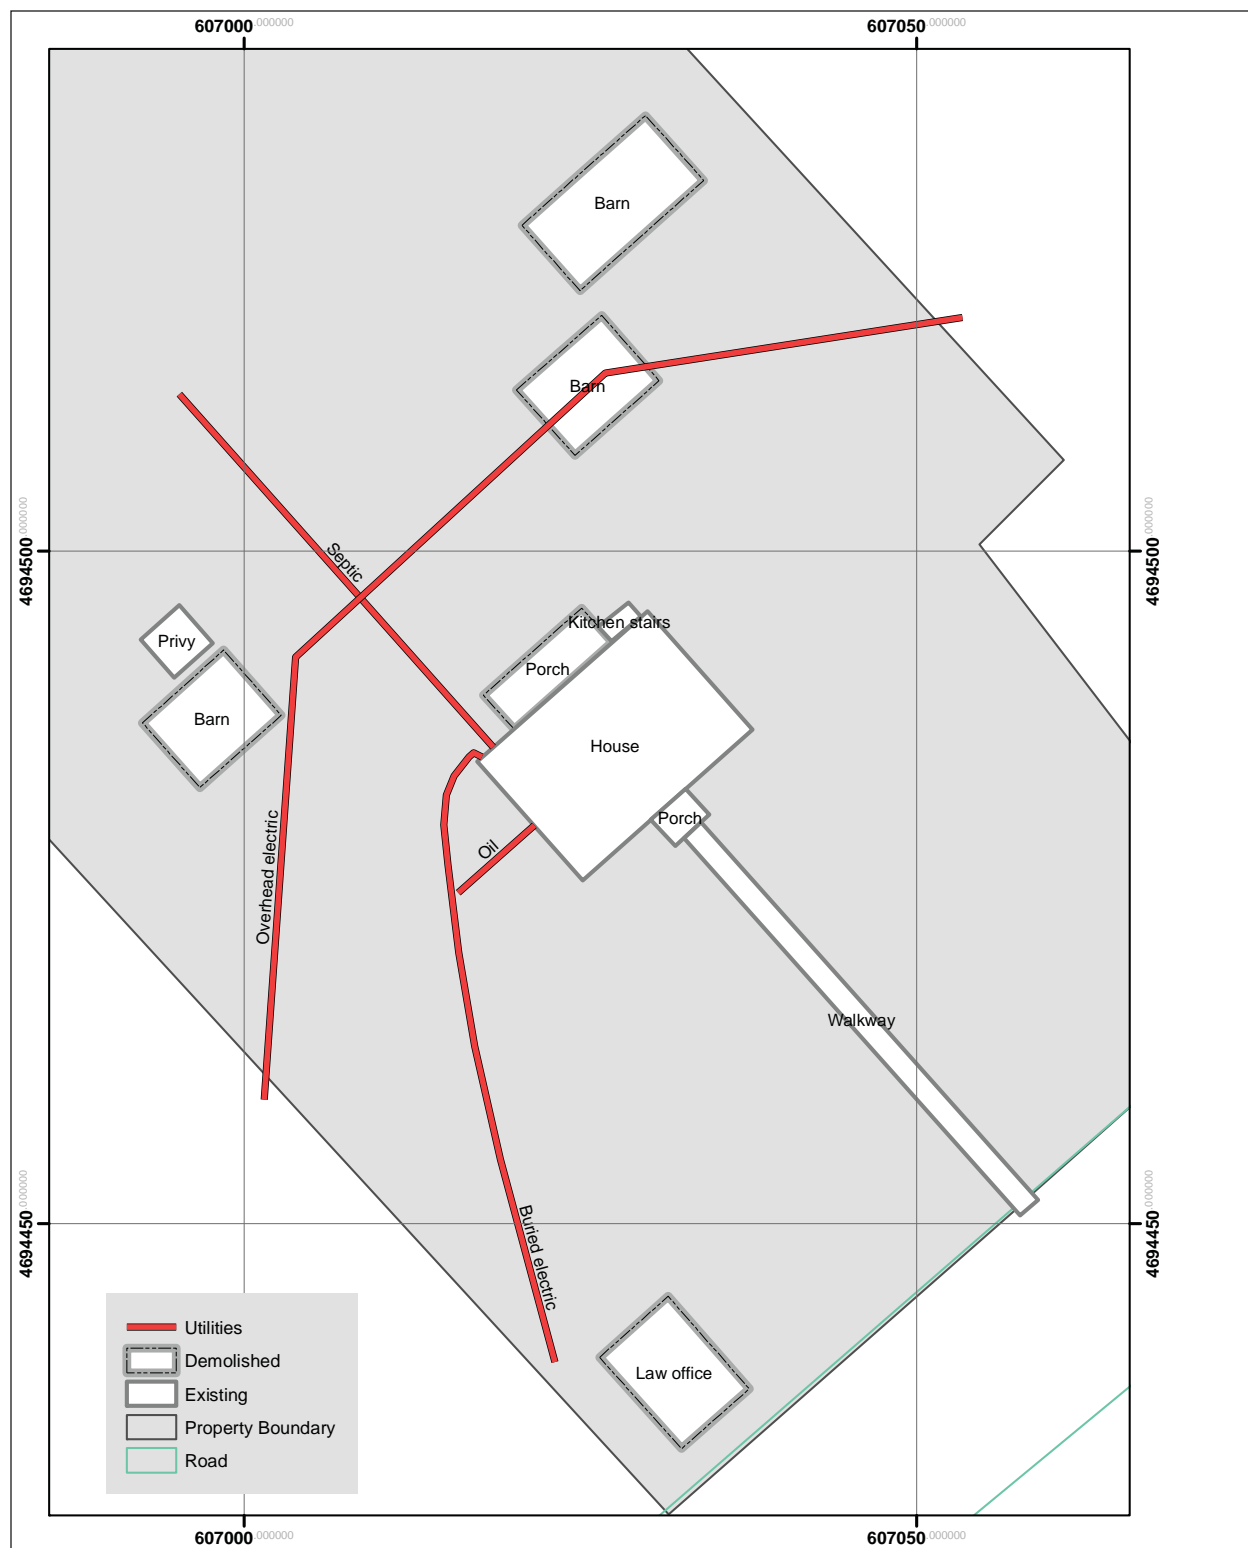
Plan showing the existing house and privy, some of the existing utilities, and the former porch and outbuildings. Outbuilding locations are based on historic documents and are taken from a plan by John G. Waite Associates, as are the locations of the existing utilities. Several utilities discovered archaeologically are not shown, including the pipes to the dry wells and a pipe running from the east half of the rear of the house into the yard.
